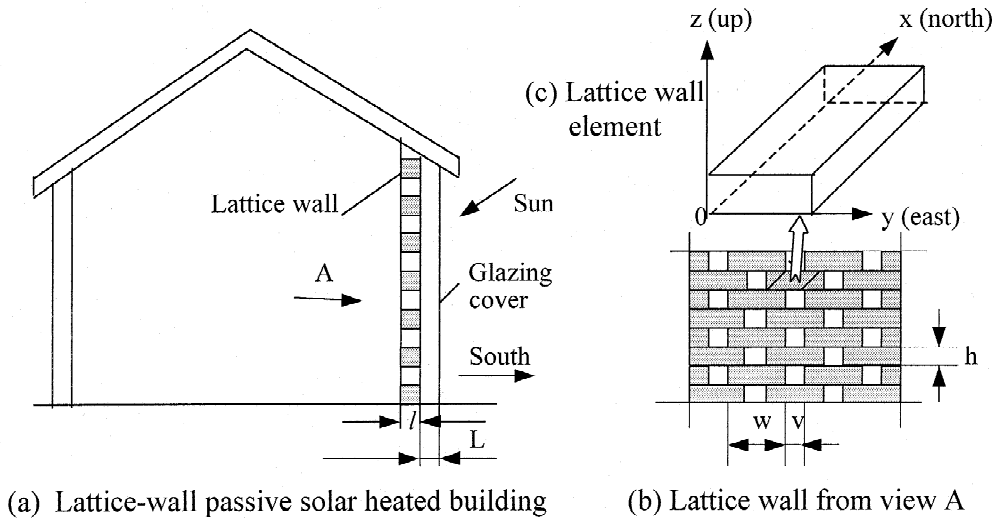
Lattice wall and lattice-wall passive solar heated building.
